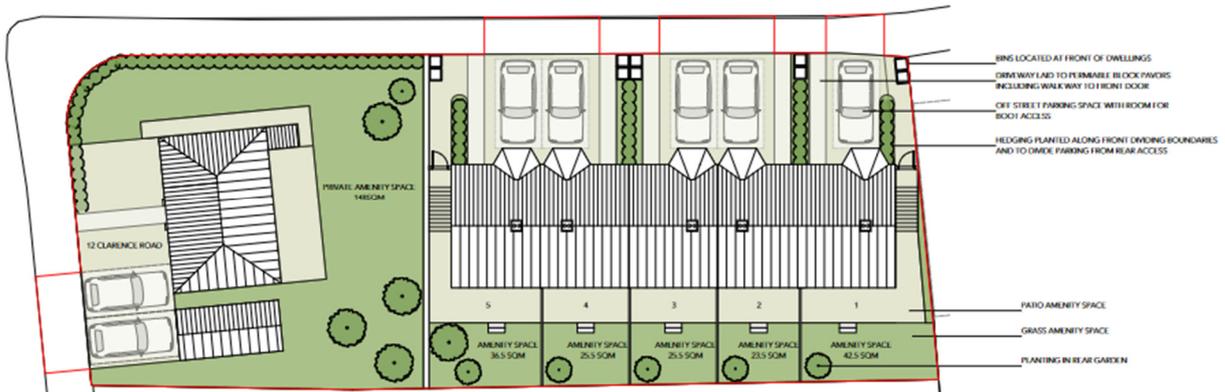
Proposed plan. 12 Clarence Road is retained (left).
